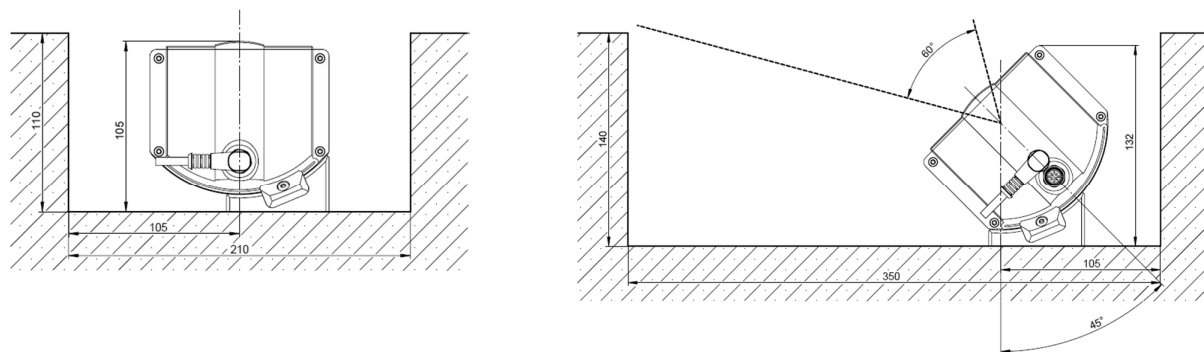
Width and depth of a wall niche (dimensions in mm)
